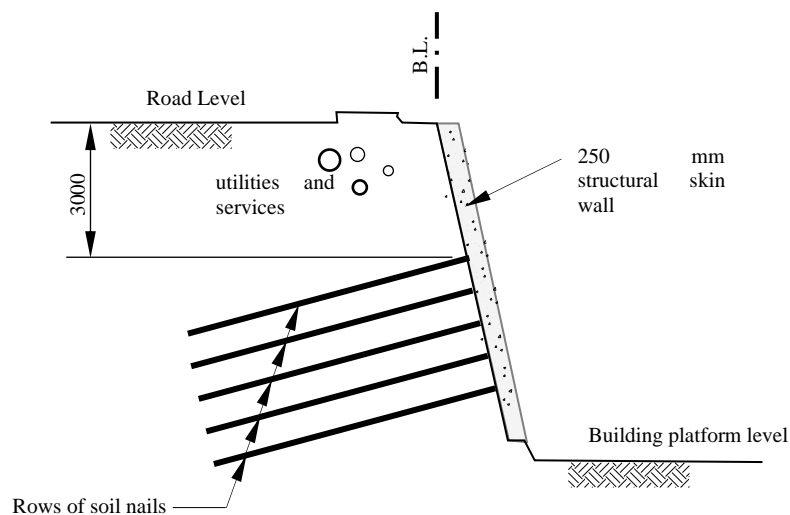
Stabilization scheme for cut slope abutting public road with soil nails installed outside lot boundary at Kwun Tong
